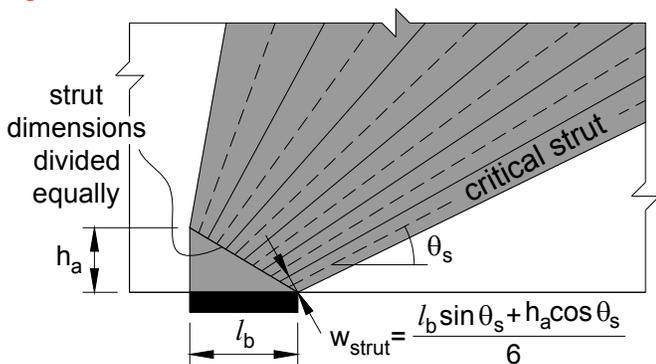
Determining Strut Area A_{sc} for critical strut in fan region - Tension Tie at Narrow Part of Fan
